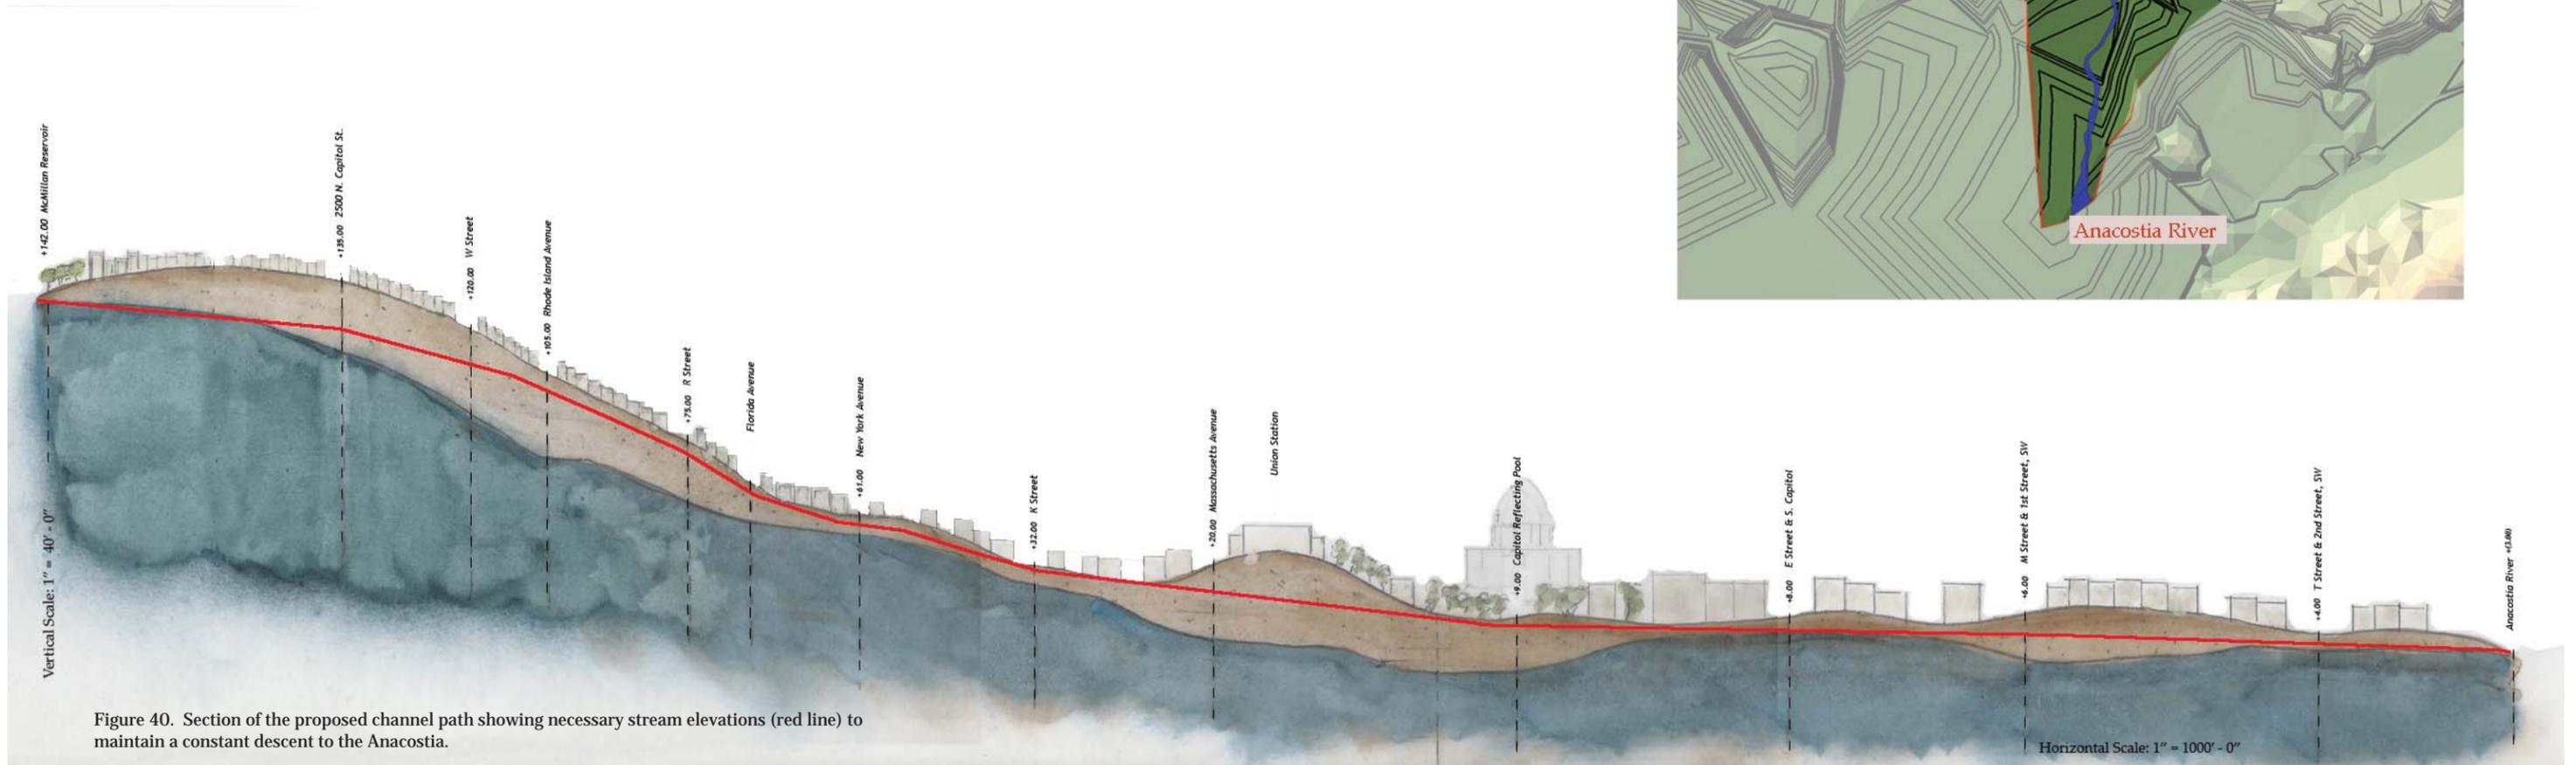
Section of the proposed channel path showing necessary stream elevations (red line) to maintain a constant descent to the Anacostia.
